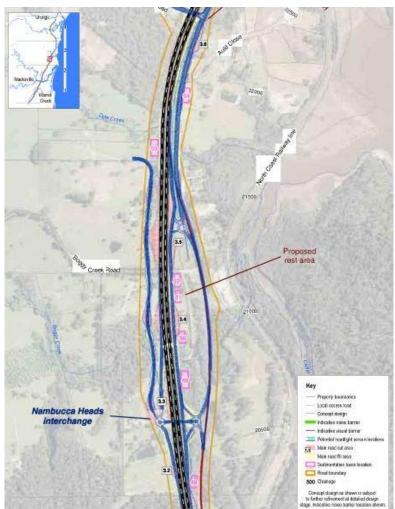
RTA Warrell Creek to Urunga - Upgrading the Pacific Highway Section 3
